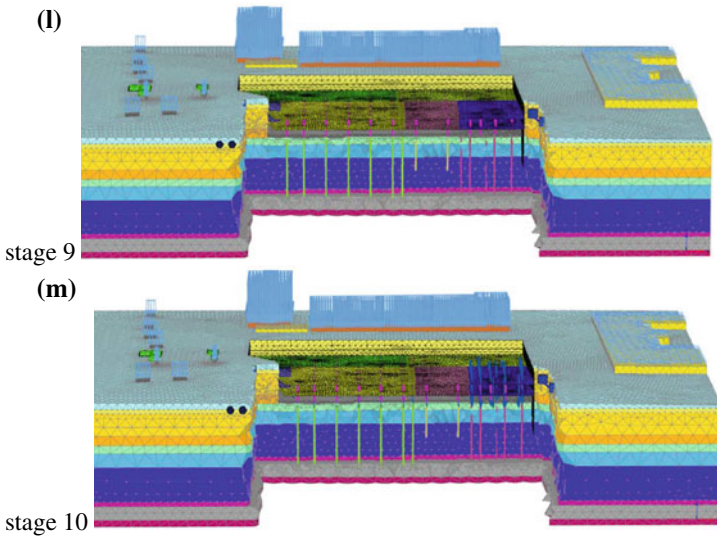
Stages of the construction modelling: l modeling of vertical structures construction of the underground part and floor overlap at mark 46.8, demounting of the second tier of the strut system at mark 48.6; m modeling of vertical structures construction of the underground part and floor overlap at mark 50.9, demounting of the second tier of the strut system at mark 52.6
